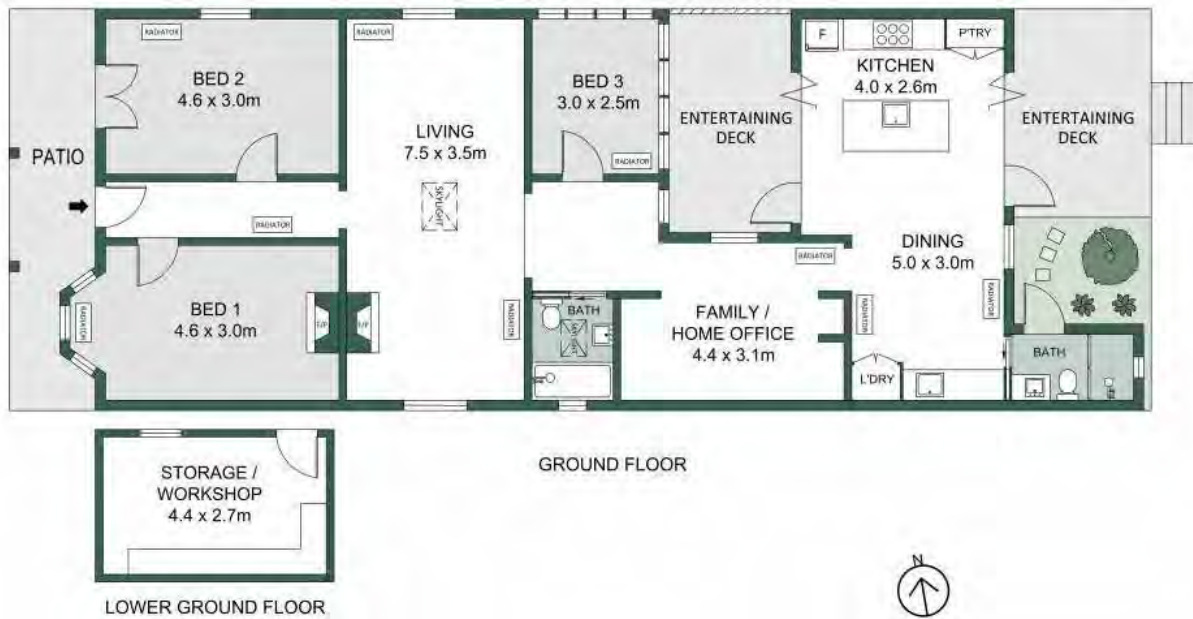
Floor plan of 11 Armstrong Street, Cammeray. (Source: <https://www.realestate.com.au/sold/property-house-nsw-cammeray-143331440>)
